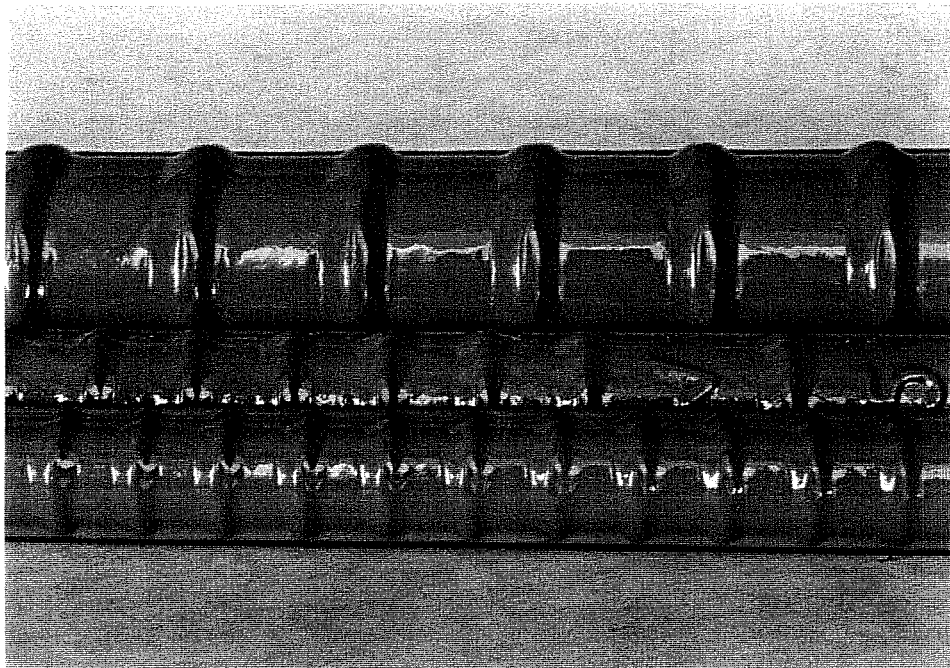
Photograph showing typical appearance of as-received ECRs with good coating integrity.
